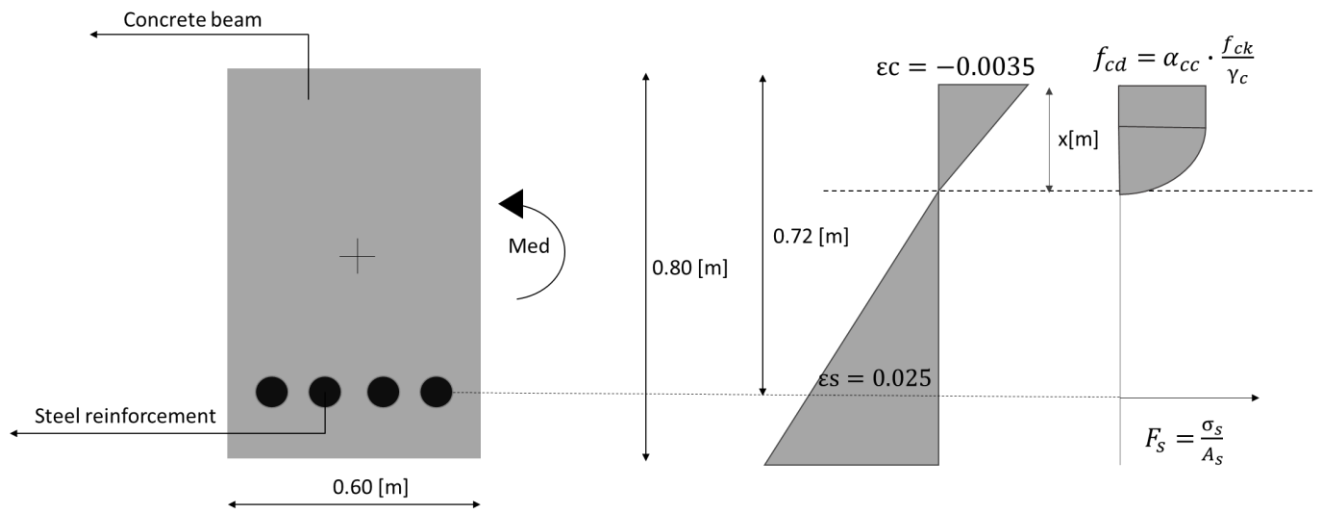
Cross section and stress- strain distribution adapted from EC2 considering failure due to concrete crushing [4]
